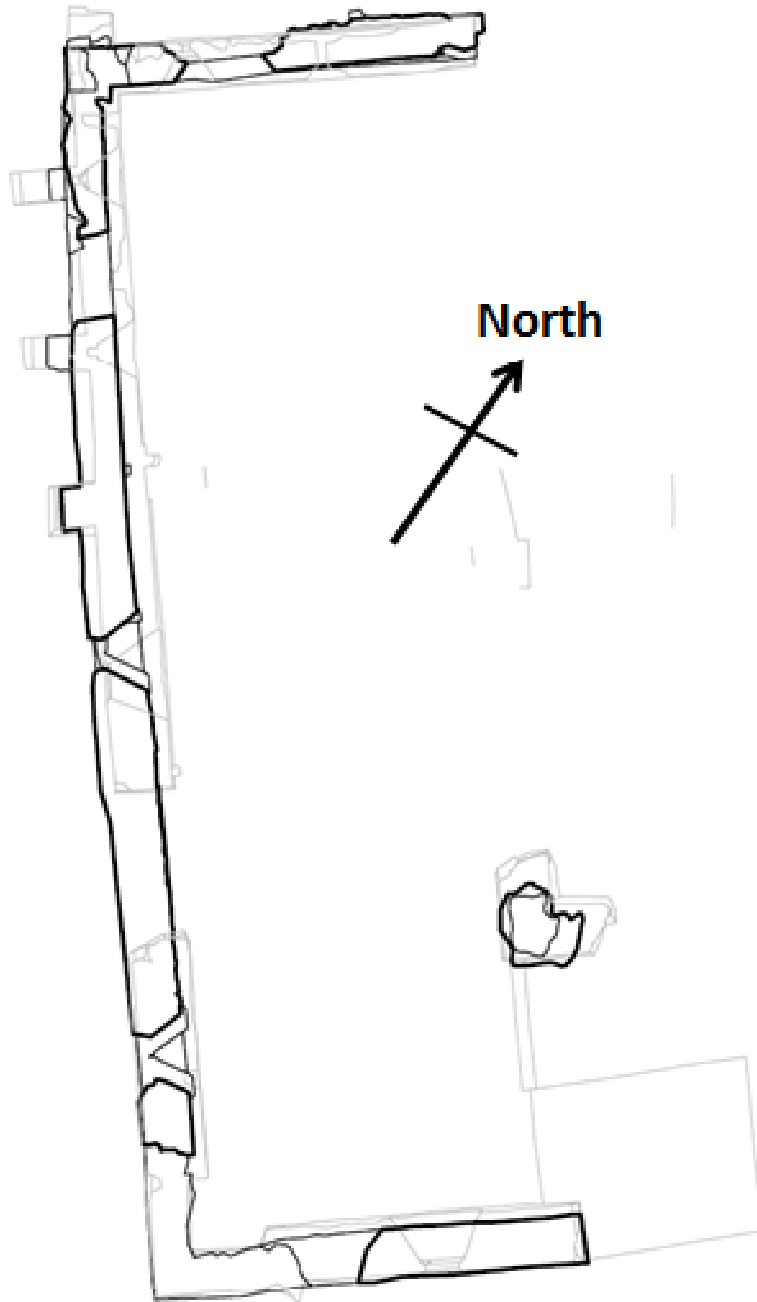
Plan of the ruins at first floor level (after English Heritage Drawn Survey Team)
